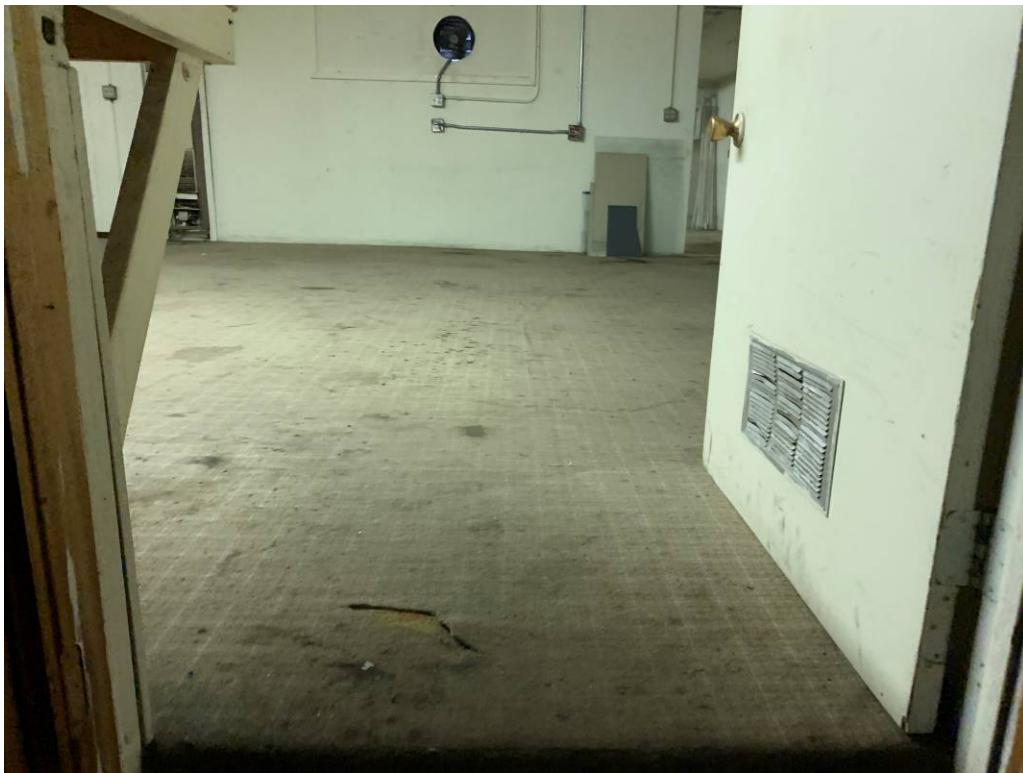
Typical finishes observed in the 2nd floor office area of the south section.
